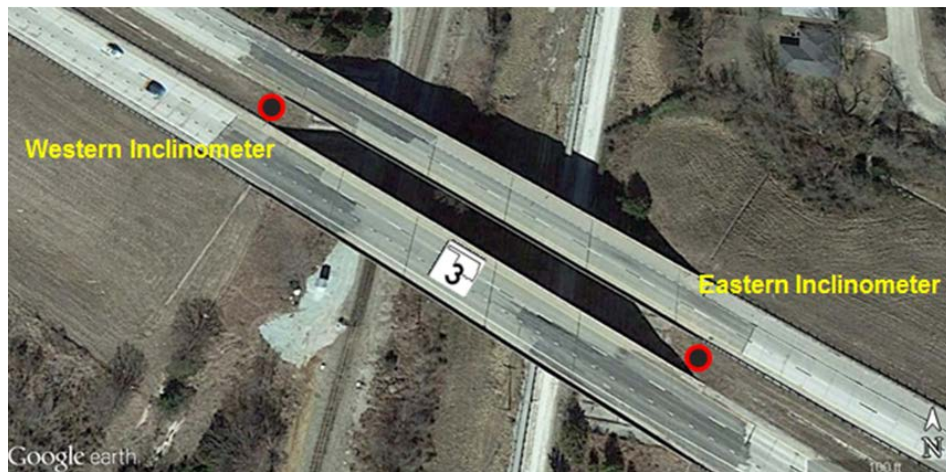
SH-3 bridges over BNSF railroad – locations of the inclinometers (Google Inc., 2013a)
